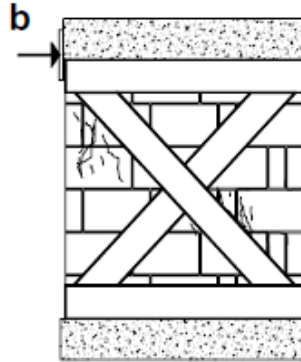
Crack pattern at failure for a wall with low GFRP density (Marcari et al., 2007).
